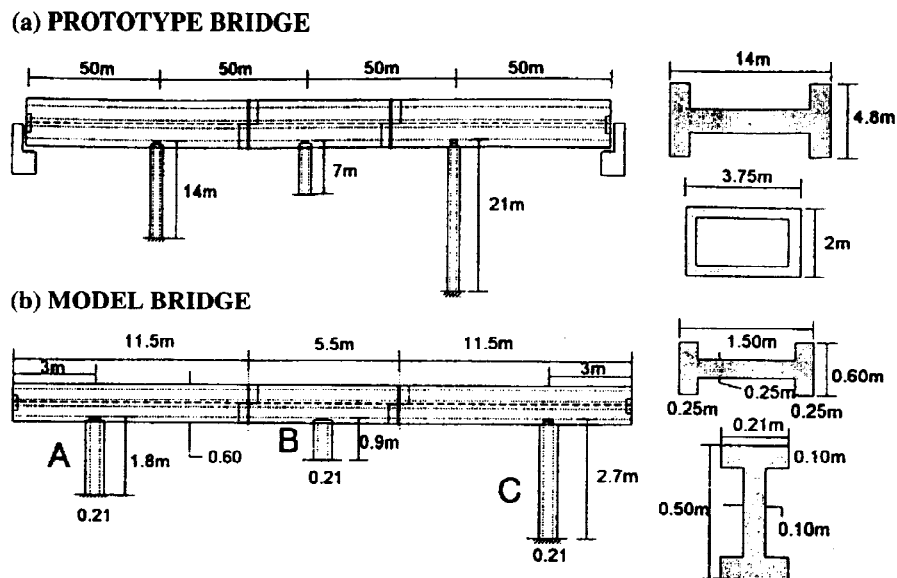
(a) Prototype bridge; (b) Model bridge specimen
